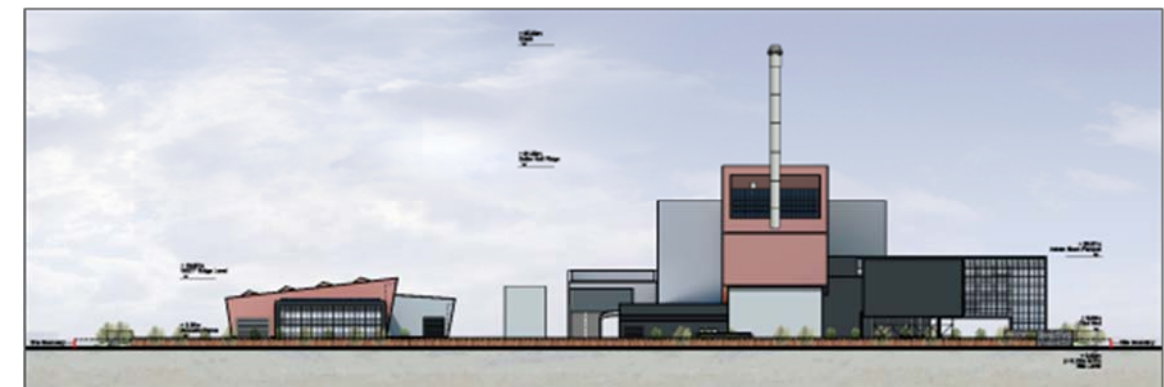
Proposed south site elevation – extract from drawing PL312
